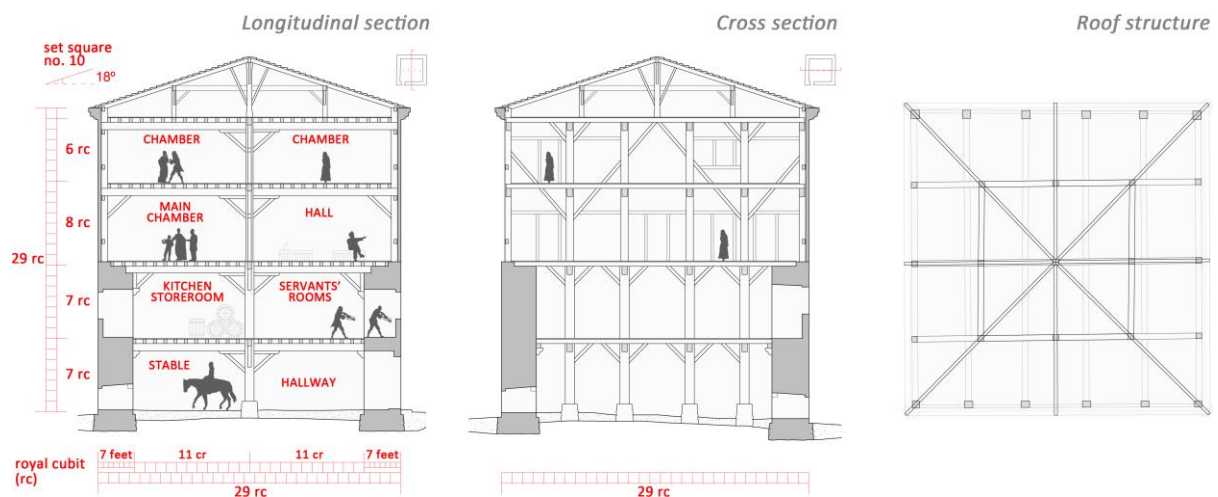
Hypothetical reconstruction of the building, sections and roof structure
